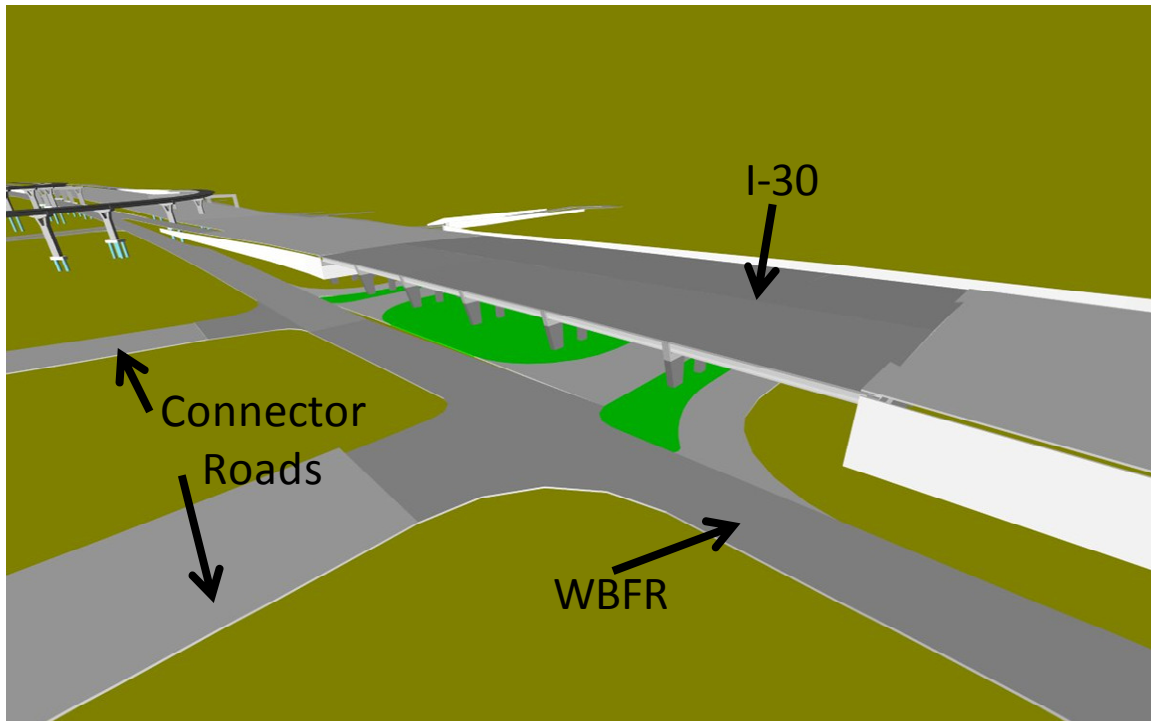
The Intersection of PGBT and I-30 Frontage Roads. (looking SE)
